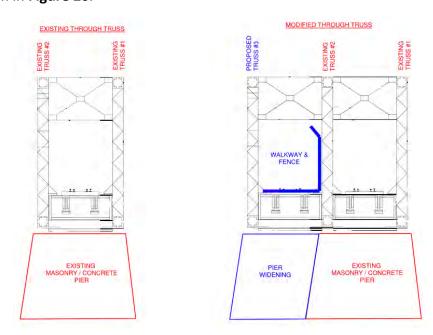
Asset 5104 Additional Truss Plane Concept (Not Recommended)
